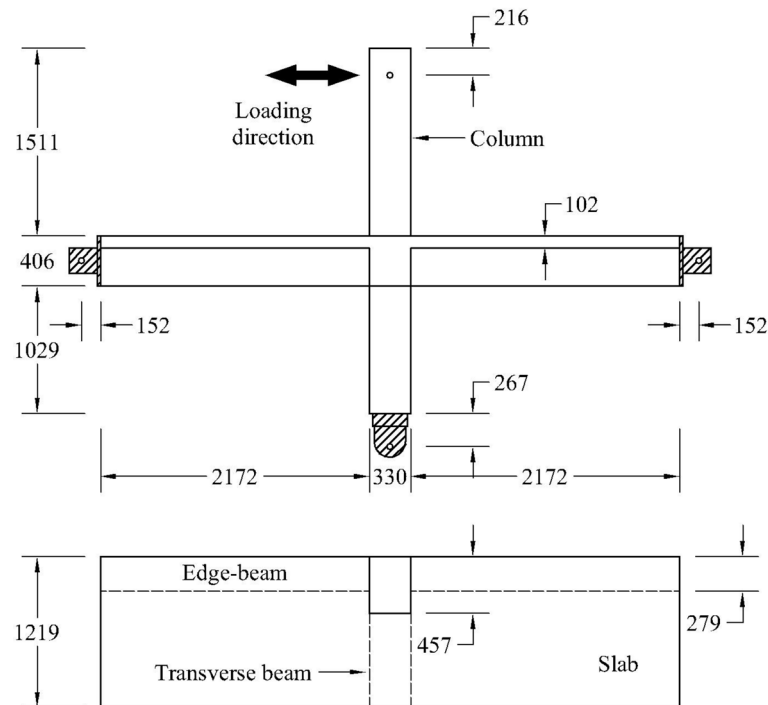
Elevation and plan views of specimen SL1 (units: mm)
